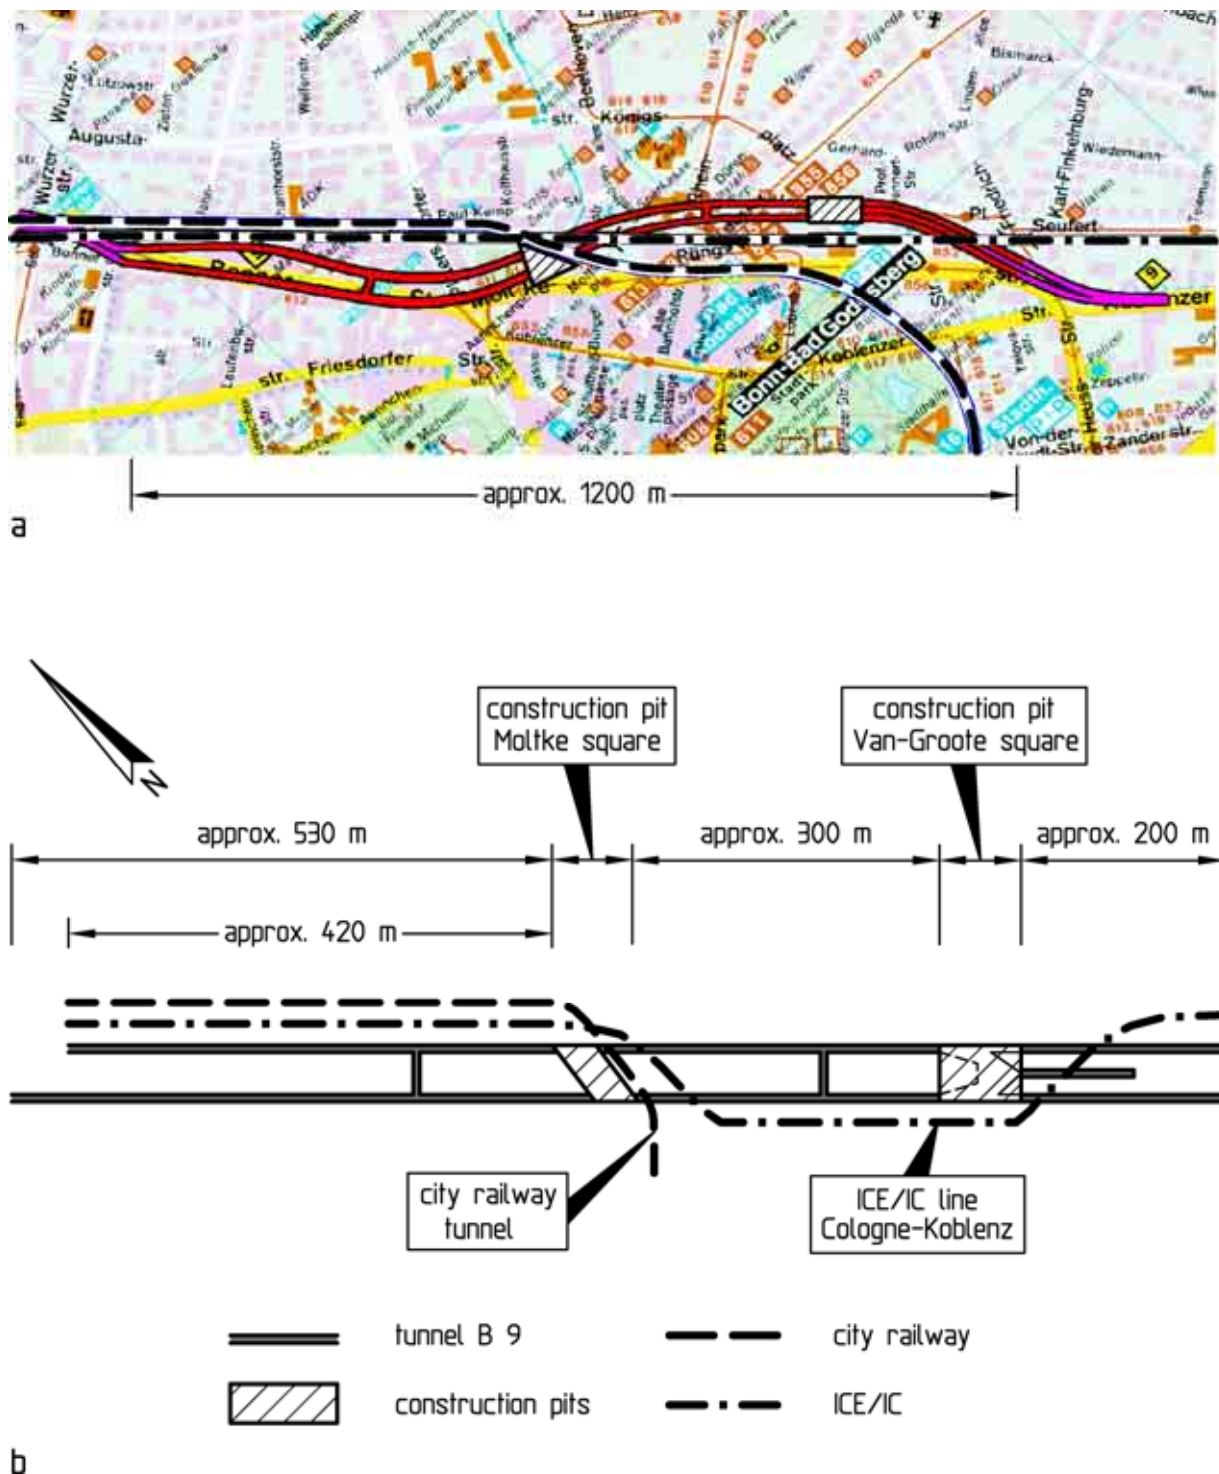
Road tunnel Bonn-Bad Godesberg: a) Site plan; b) schematic representation of the structure
